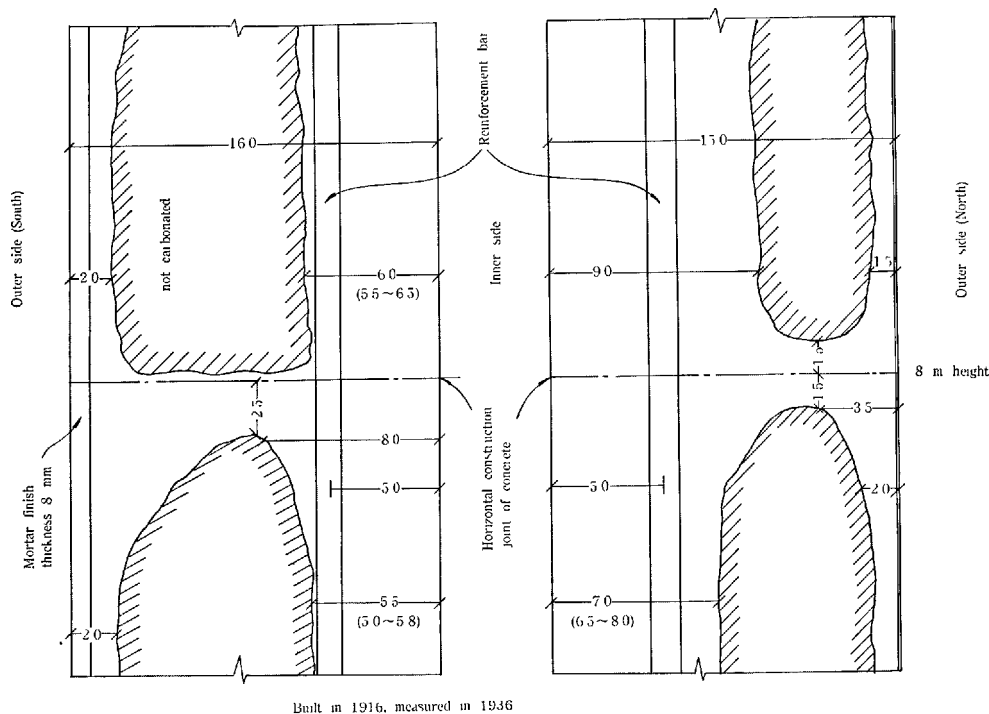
Chimney for heating wooden dormitory building in Tokyo
